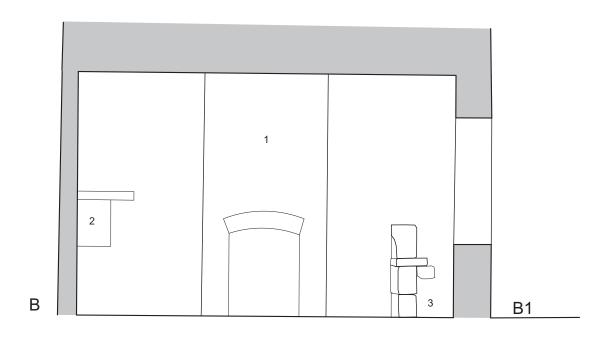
Sectional Elevation B-B1 South facing. Print Scale 1:50
